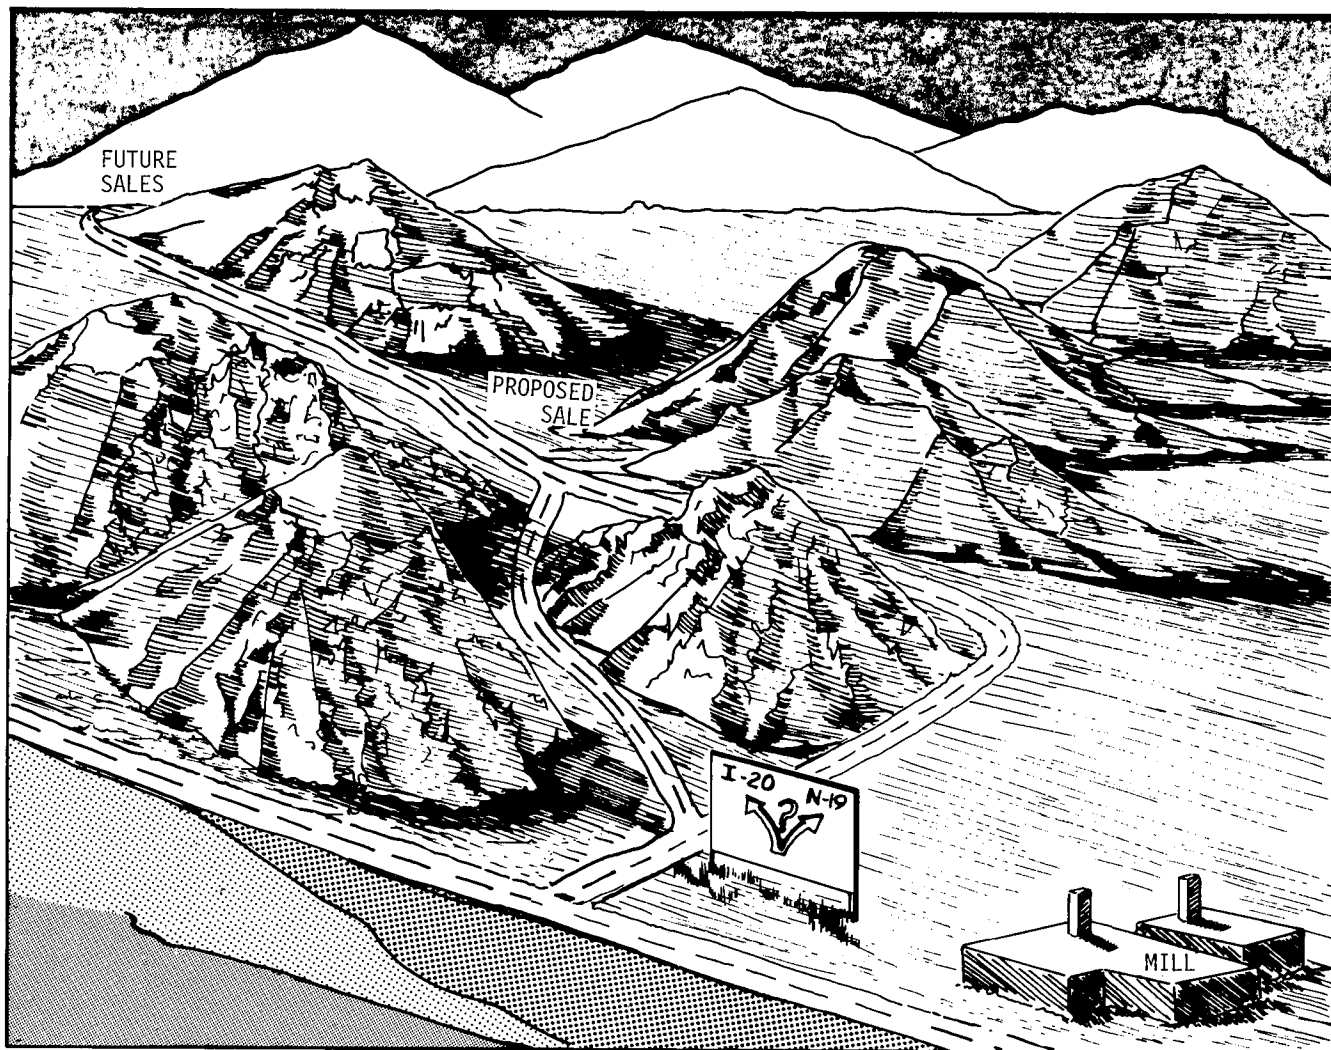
Construction of Road I-20 vs Reconstruction of N-19.
